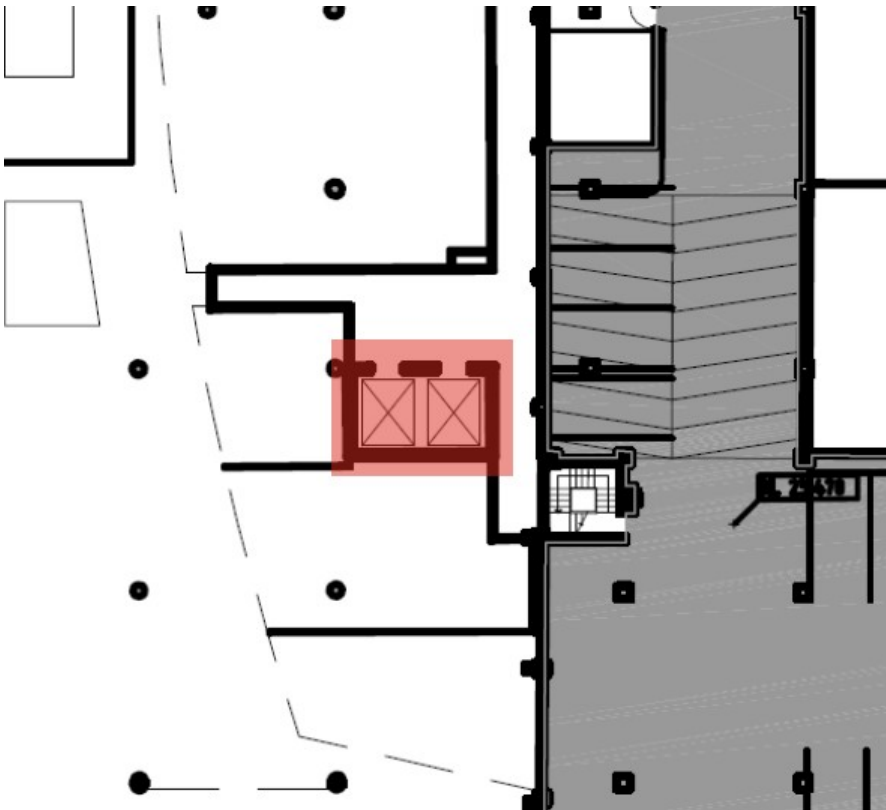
Dock #5 waste transition corridor from proposed commercial tower to Dock #5
